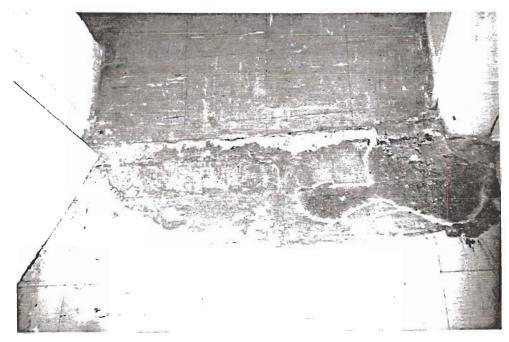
Basement Level Damage at Vinyl Floor at Entry to Kitchen.
